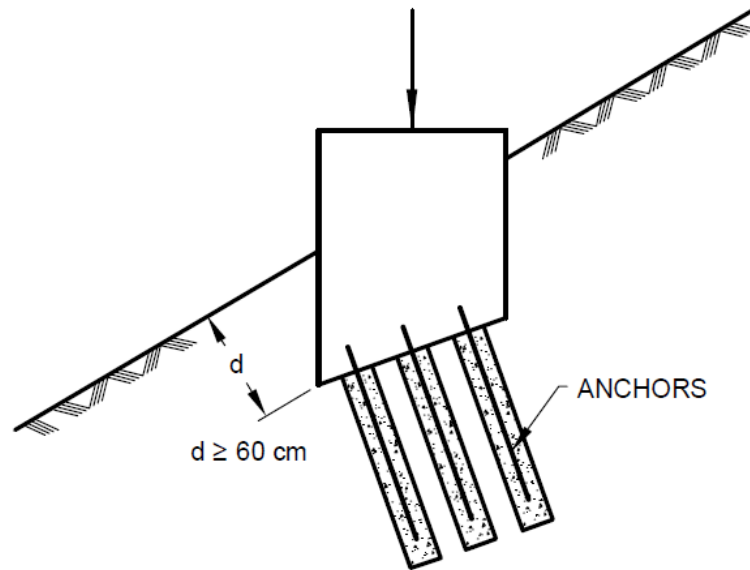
FOUNDATION ON STEEPLY DIPPING SLOPES
